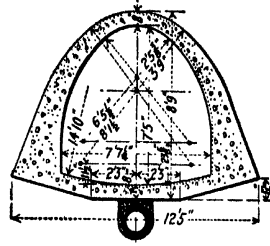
Borough of the Bronx, New York City. Horse-shoe shaped, 8 ft. 6 in.  $\times$  6 ft. 9-1/2 in.; very heavy construction for soft foundation. Transverse arch bars, 3/4 in. square 10 in. c. to c.; transverse invert bars, 1-1/8 in. square, 10 in. c. to c.; longitudinal bars in arch, 1/2 in., 12 in. c. to c.; longitudinal bars in foundation over piles, 1/2 in. square, 6 in. c. to c.; transverse reinforcement in concrete caps over piles, 5/8 in. bars.
